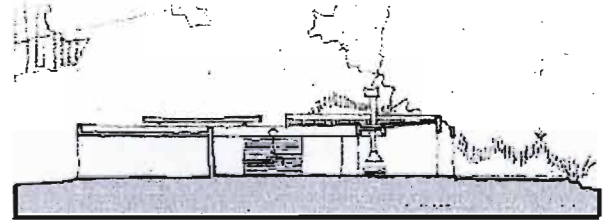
BDG – House Jordaan (1973). Section. Drawn by D. Jordaan
